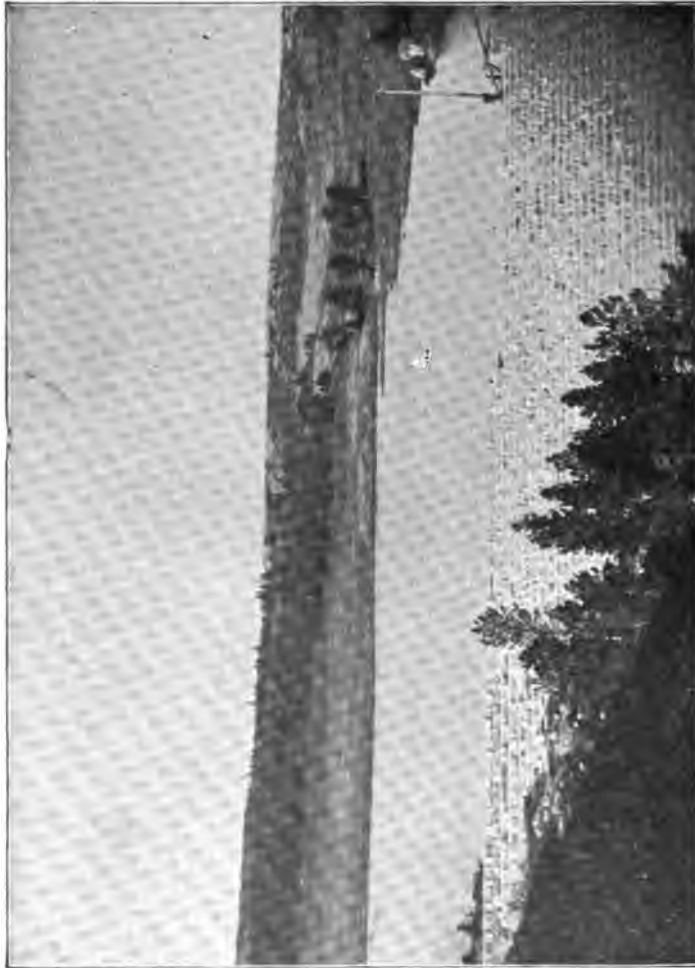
VIEW OF CASTLEWOOD DAM, COLO., DURING CONSTRUCTION, LOOKING NORTH.
